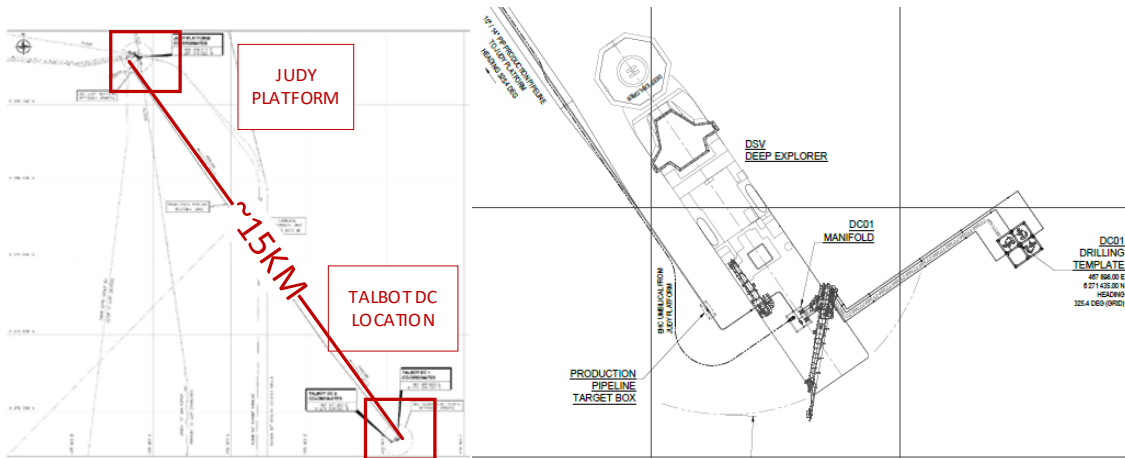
2 – Current Talbot Field layout plan (subject to change)
